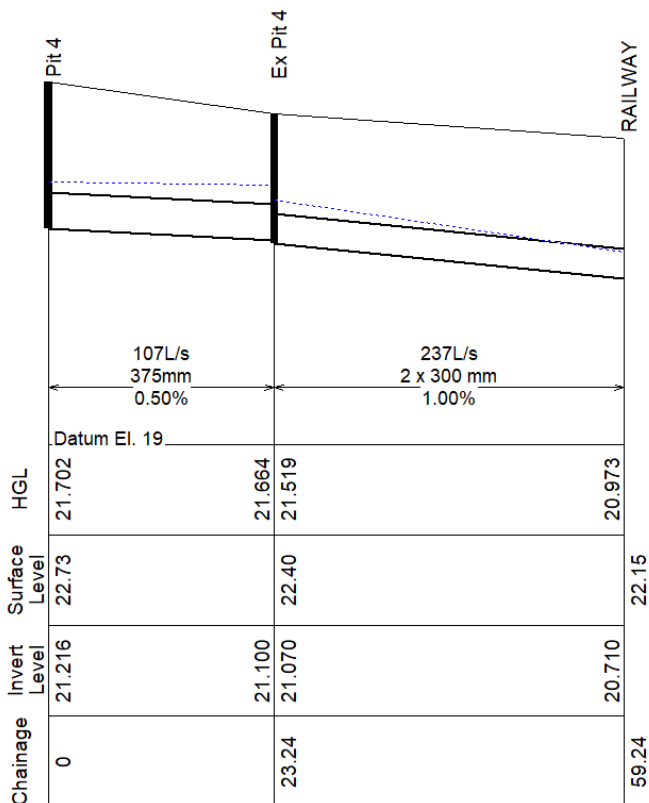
Proposed 10 year Drainage Longsection Thomas St in DRAINS
